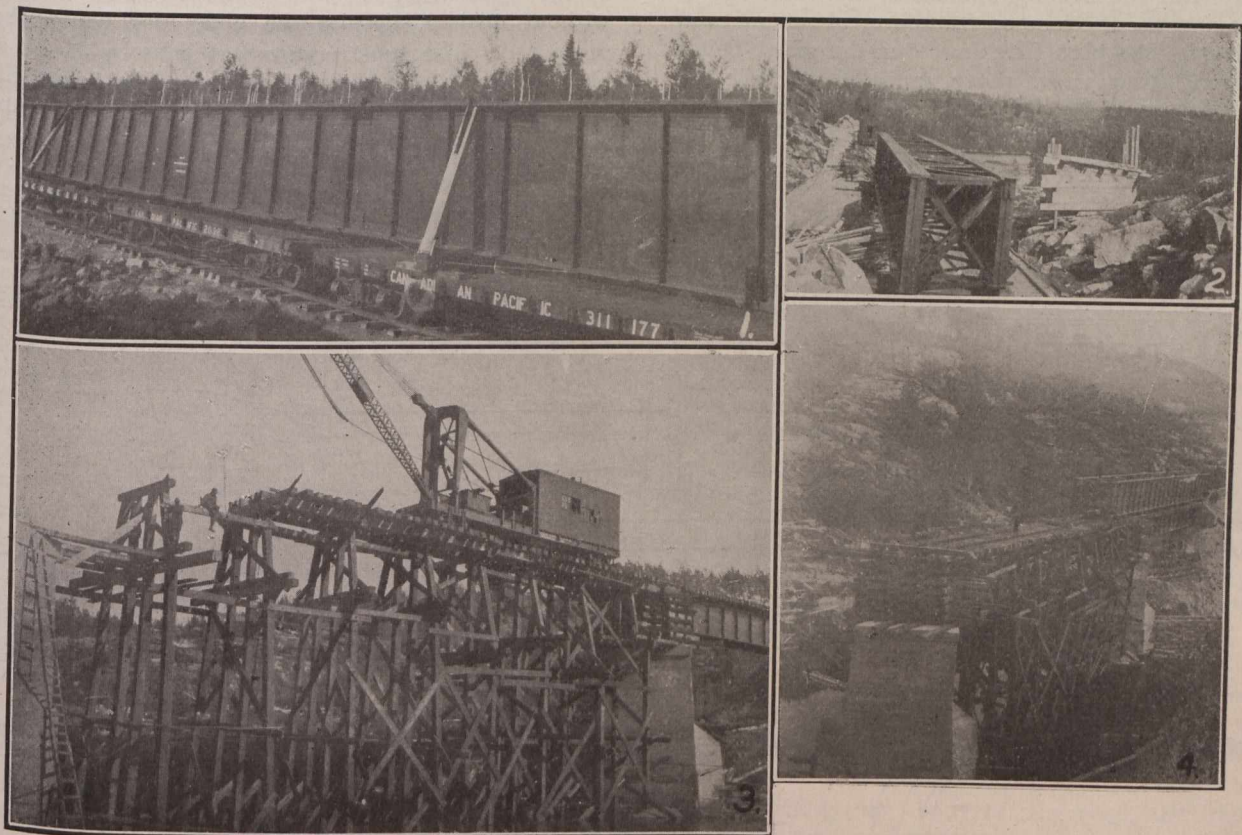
A 130-ft. Girder on Cars. Fig. 2.—Span (130 ft.) assembled.
